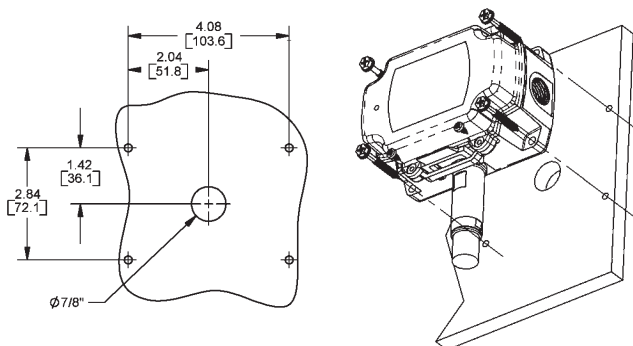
The BAPI-Box enclosure and mounting hole dimensions.
